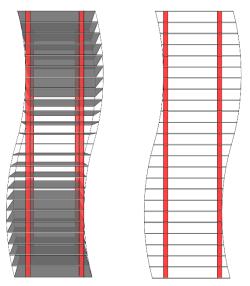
Schematic drawings of inclined columns and offset columns in twisted buildings (drawing by the author)
